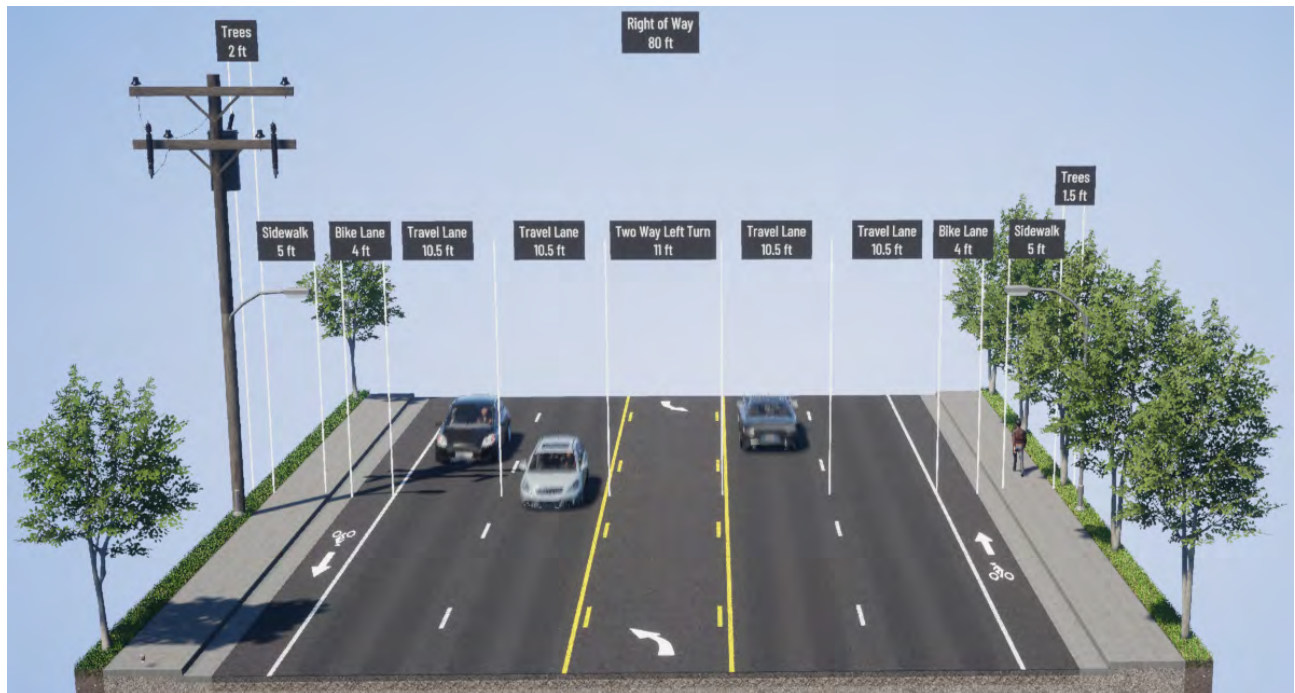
Typical Section for Port Republic Road (north of Peach Grove Avenue / Neff Avenue)
